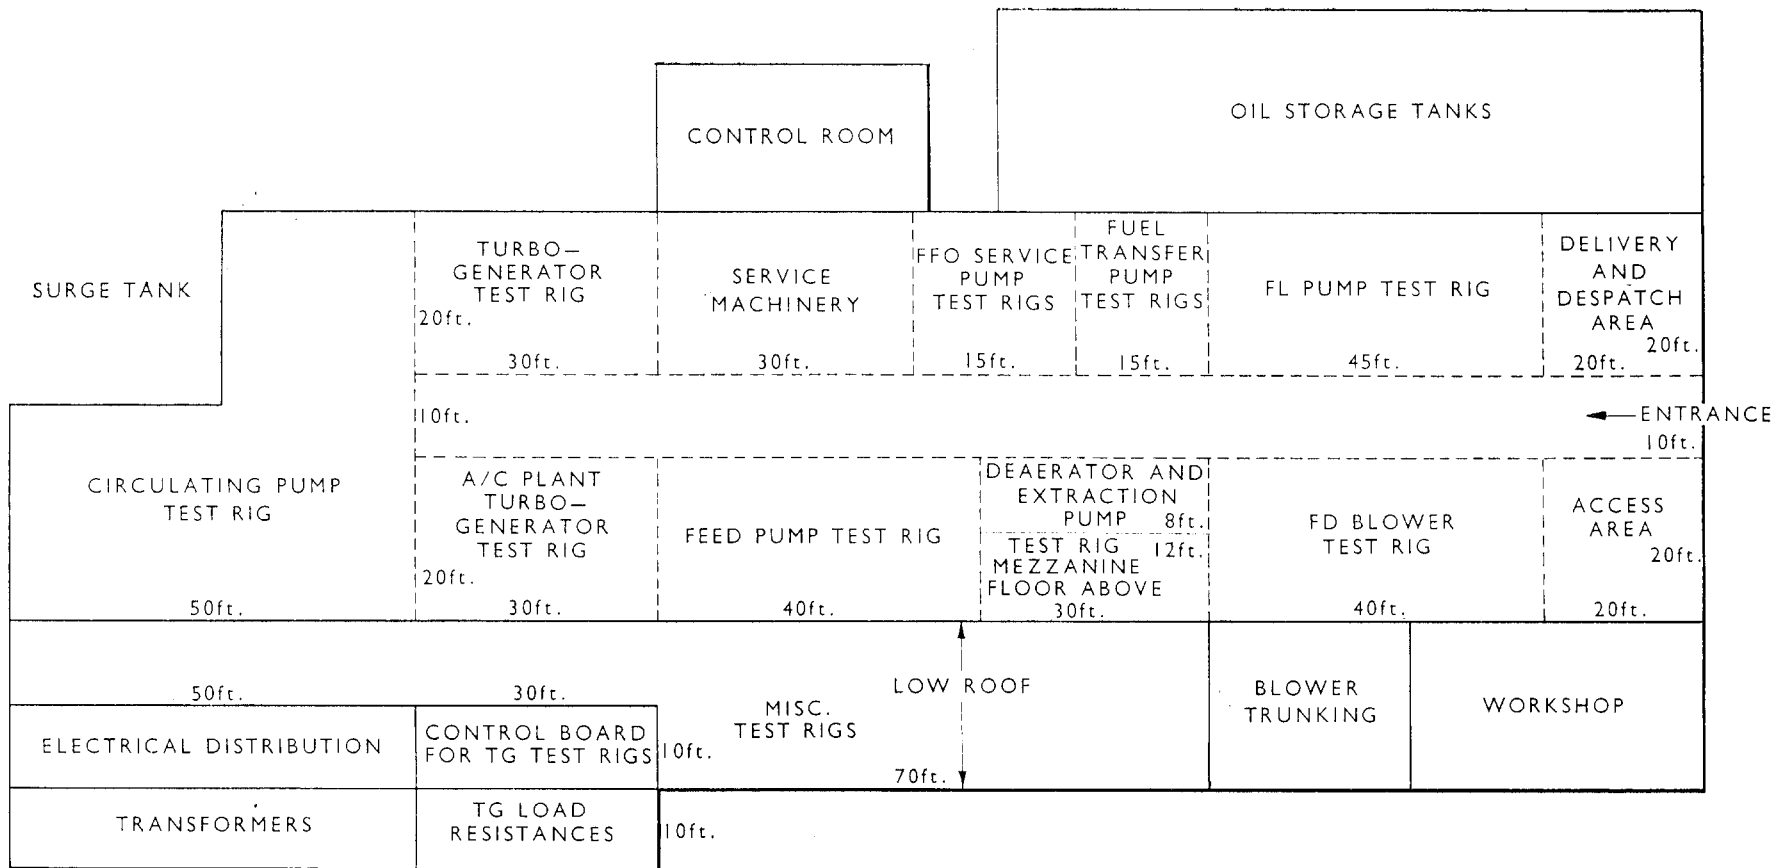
AMTH—PLAN OF TEST RIG LAYOUT
